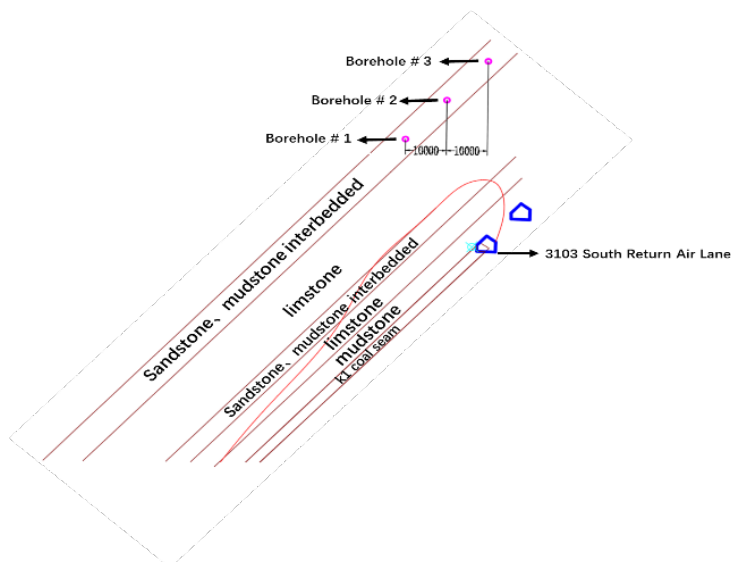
Cross-sectional view of inclined arrangement of drilling holes
